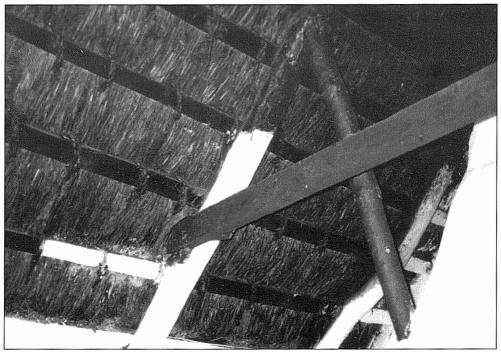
Support for ceiling and part of chimney breast. (Photographed by author, 2003).
